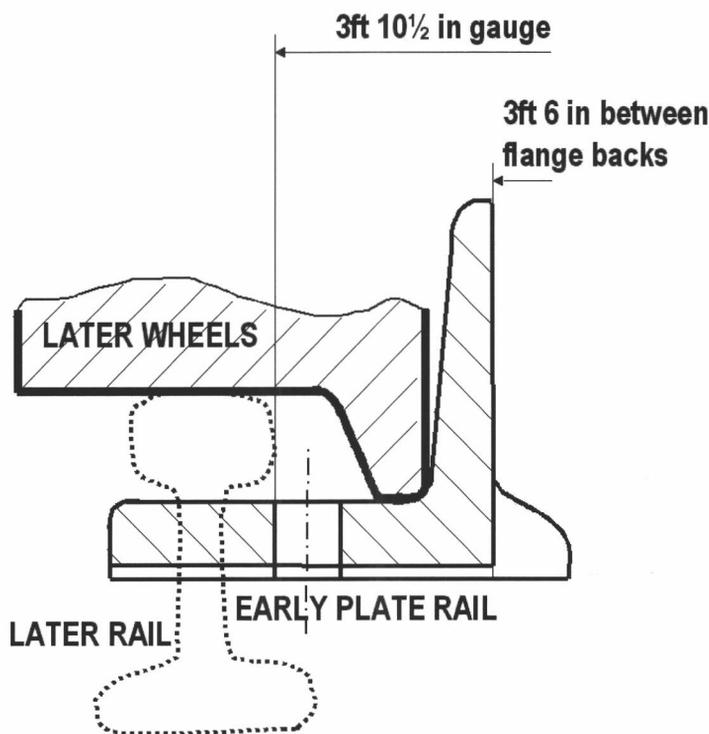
Diagram showing the possible transition arrangement between the plateway and the later railway track.
